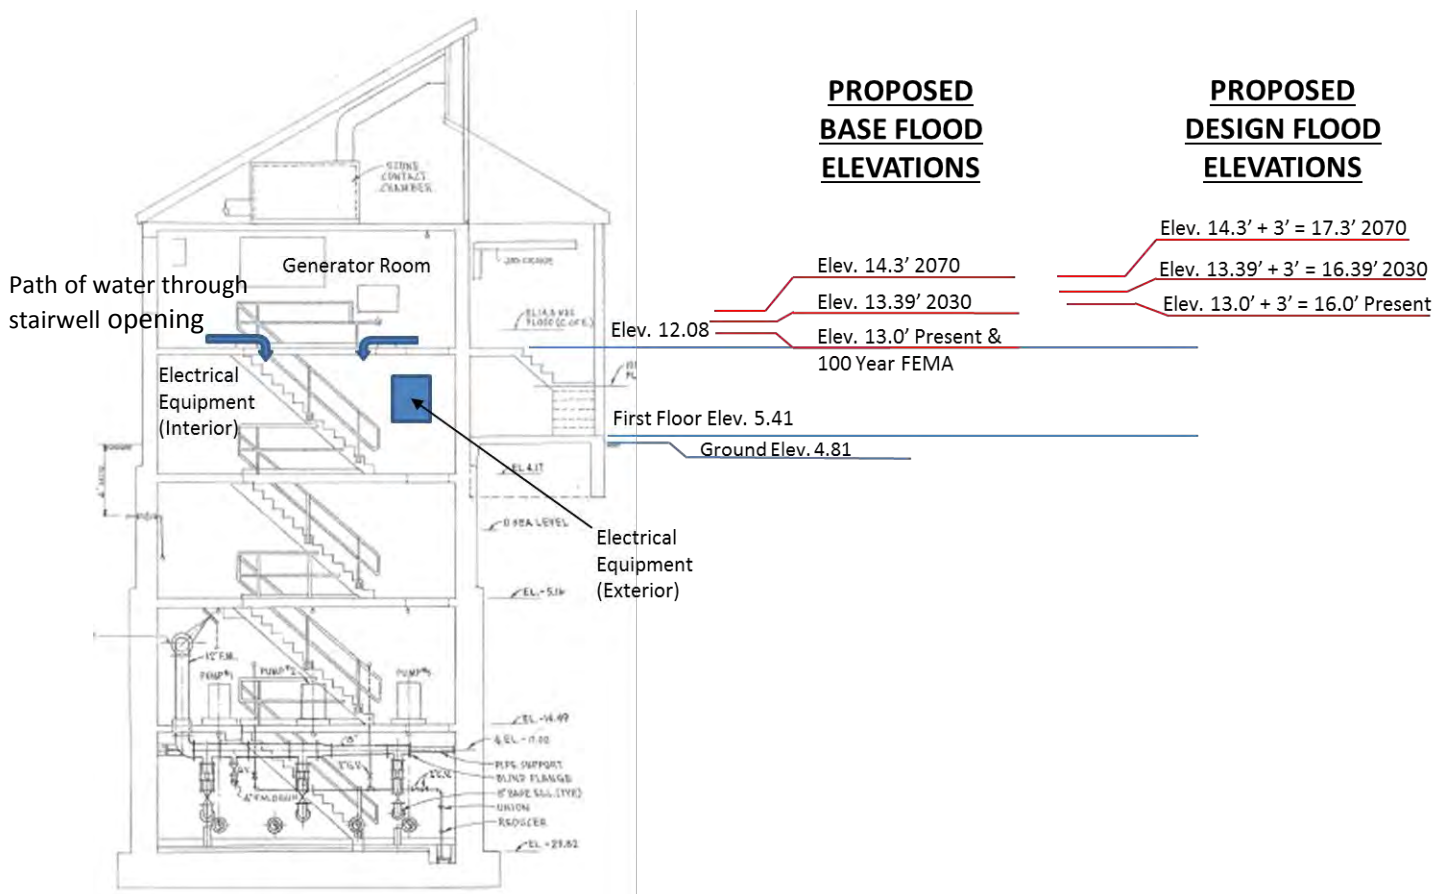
Cross-Section of Mago Point Wastewater Pump Station
